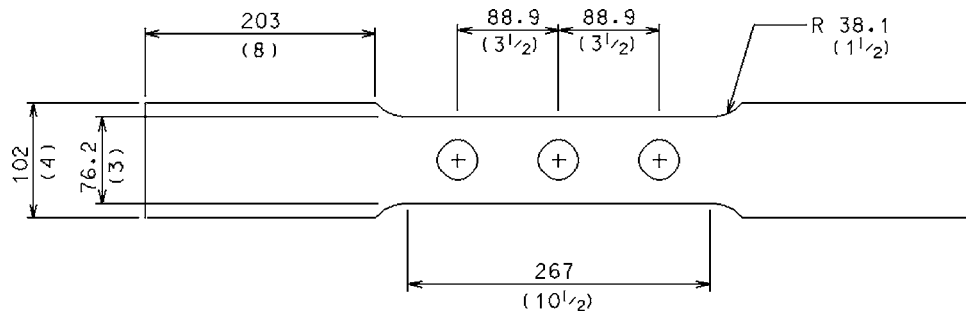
Dimensions of bolted splice fatigue specimens [mm (in.)]
